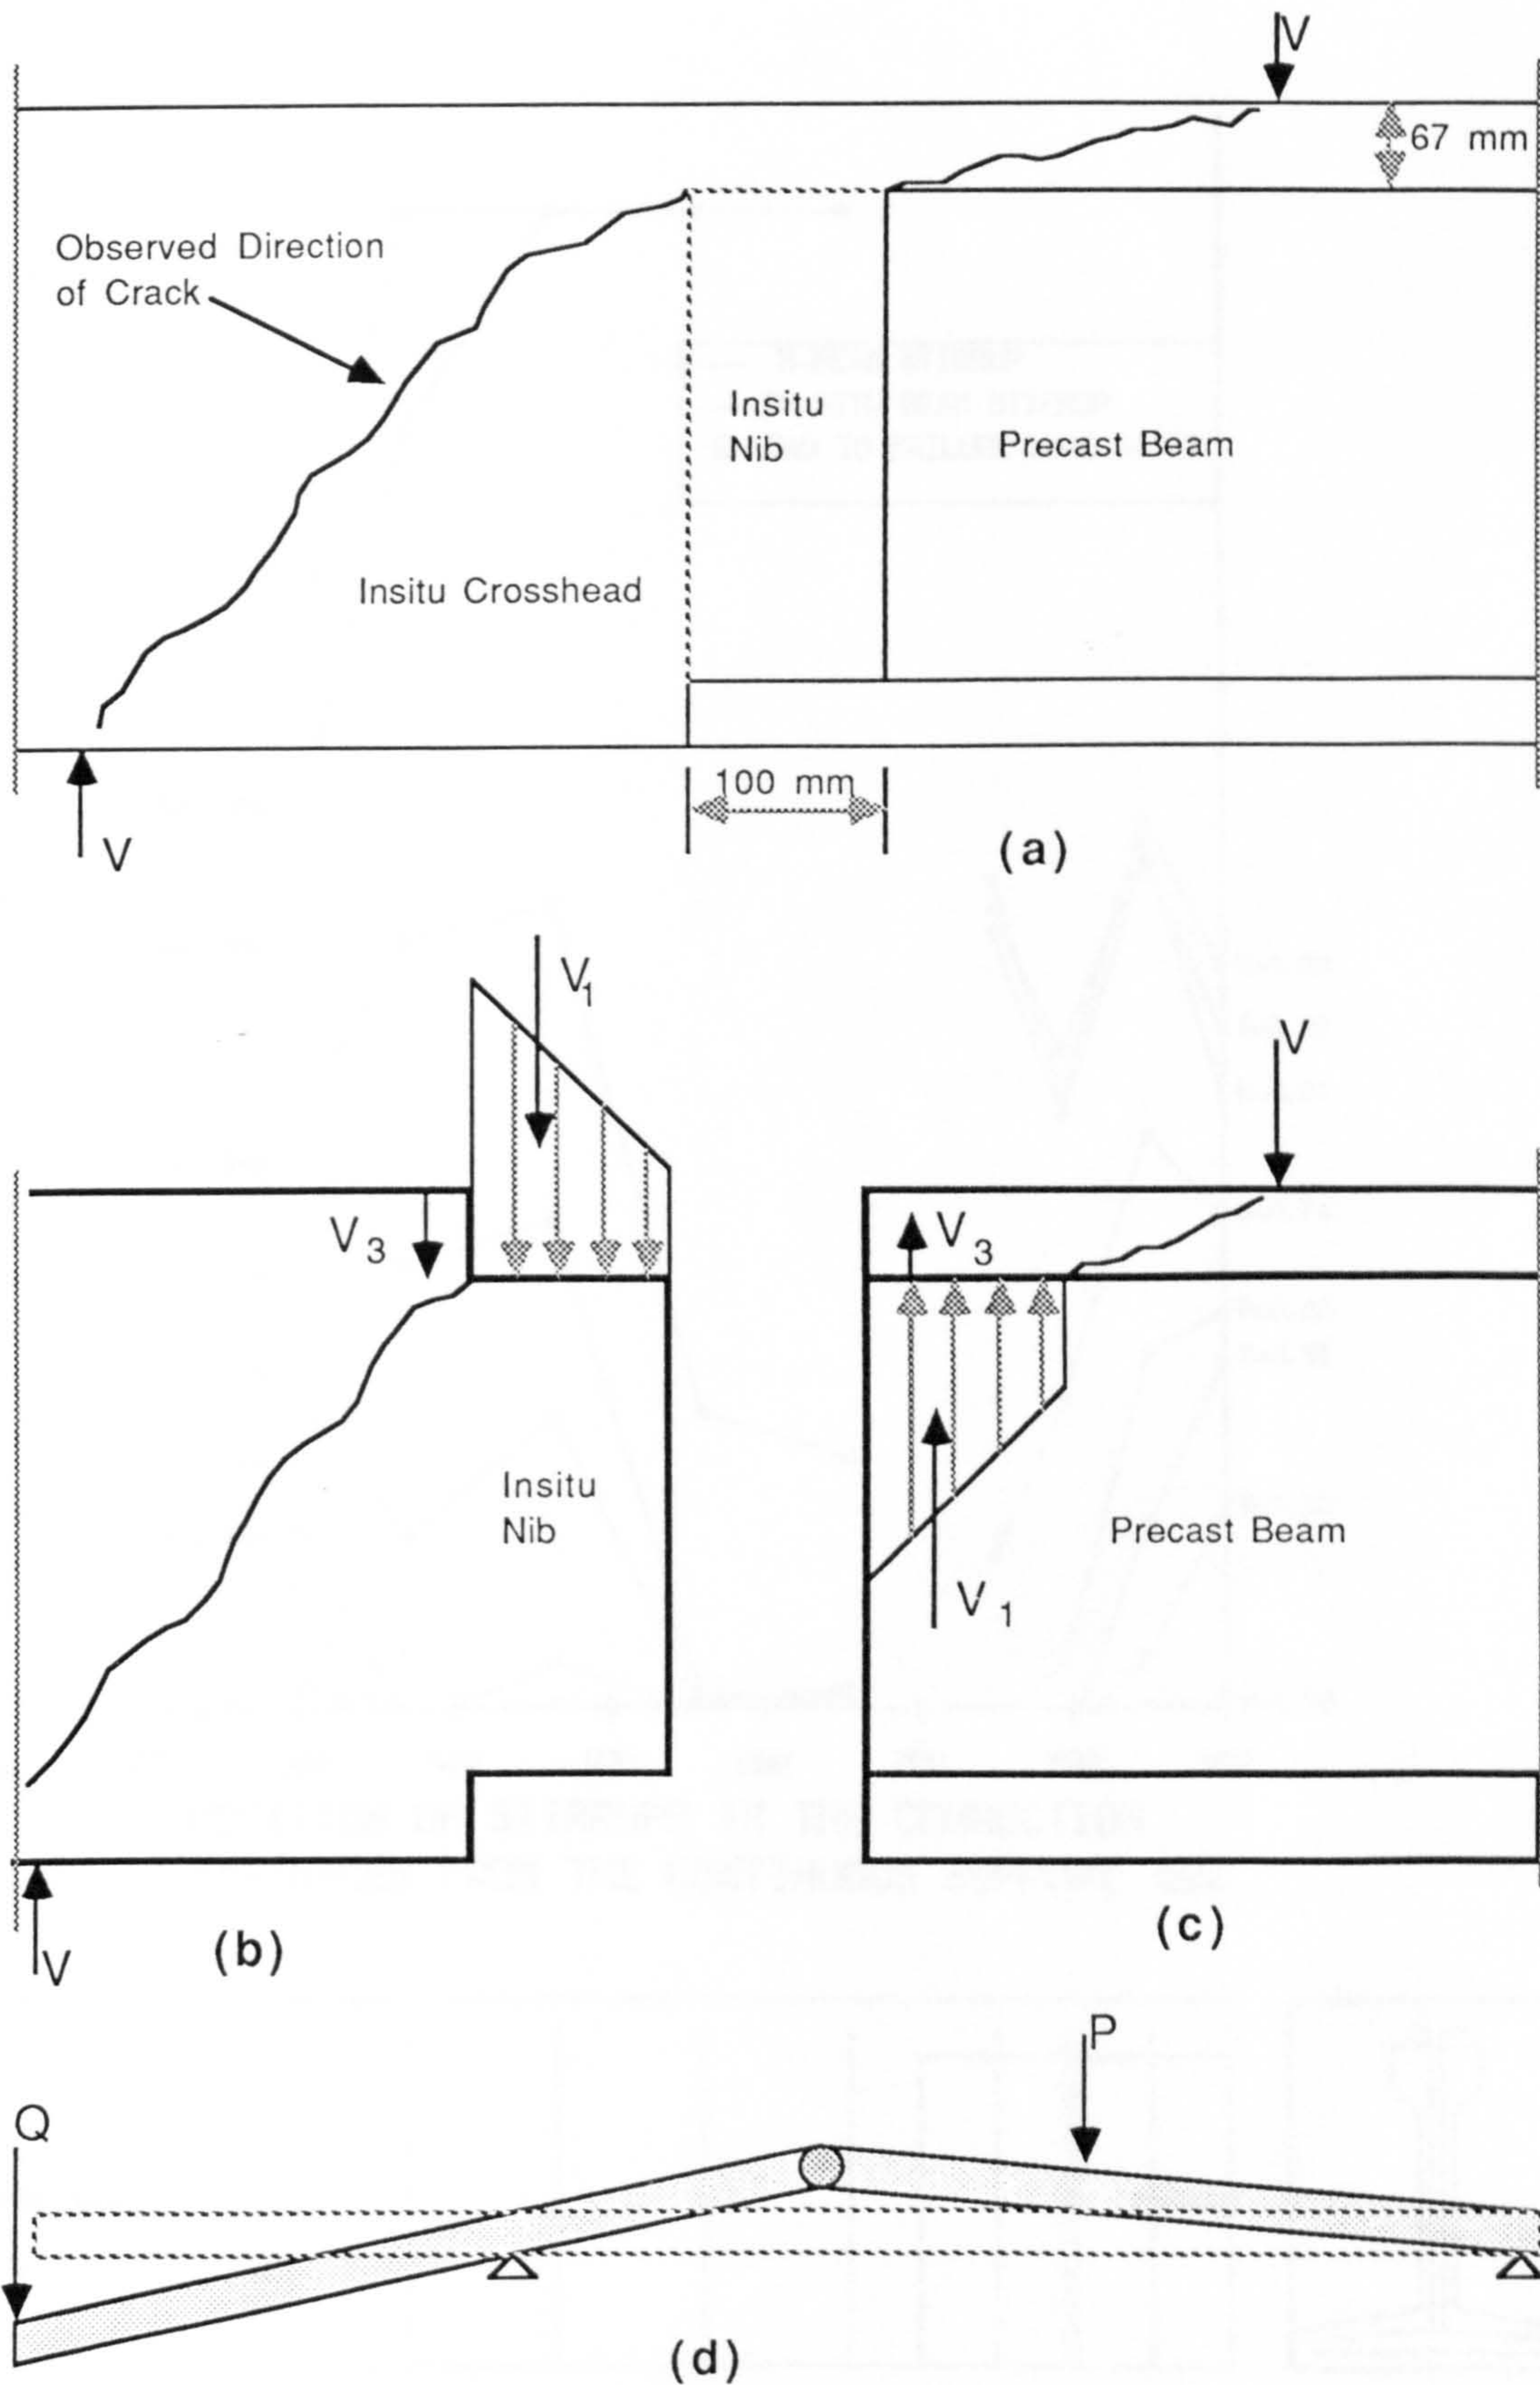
a) 100mm Connection and Cracks at Failure
